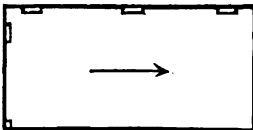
(Light superabundant.) Room 32 x 18, windows advantageously placed, glass area=1-5.3 of floor-area, and the room looks fully upon the sky.
